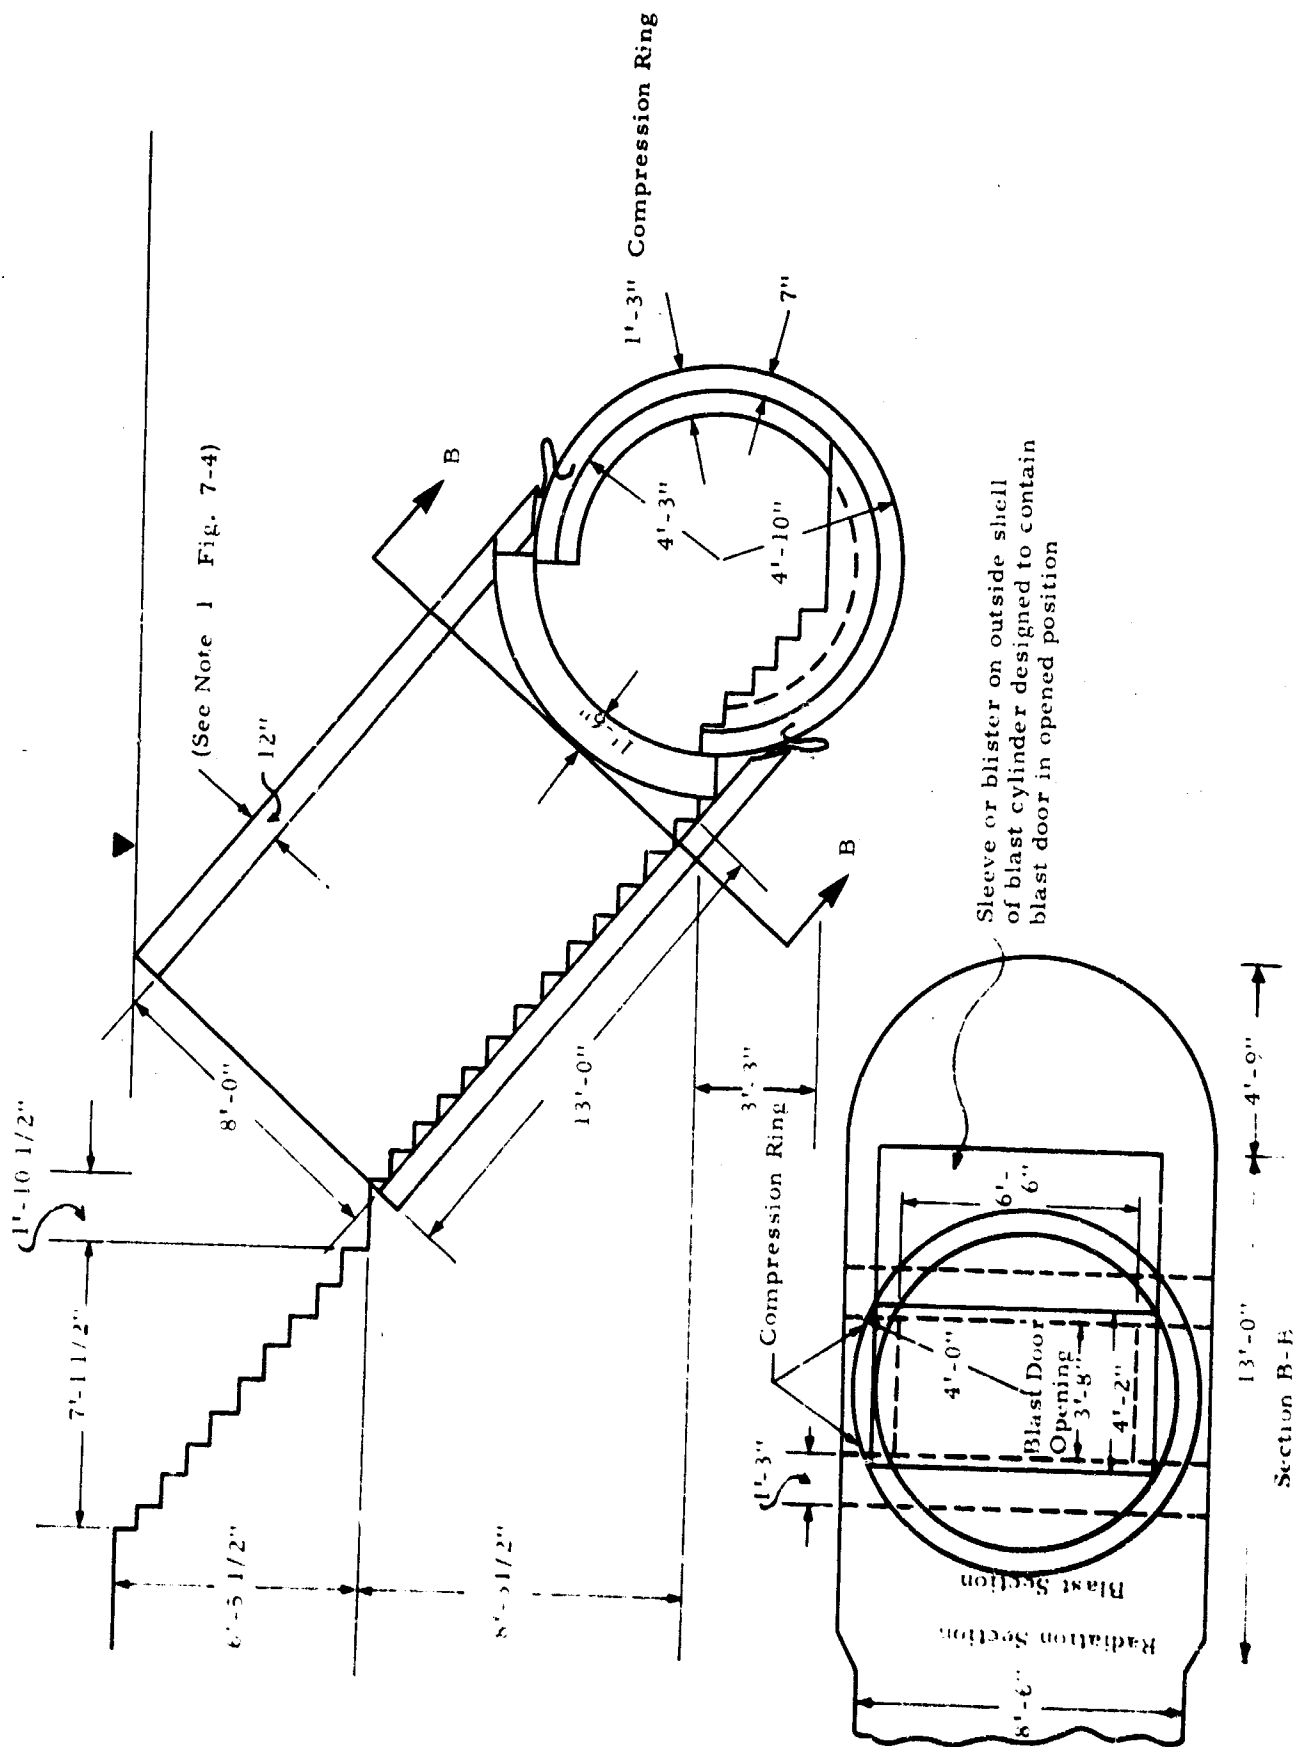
SECTIONAL VIEW OF COMPRESSION CYLINDER
